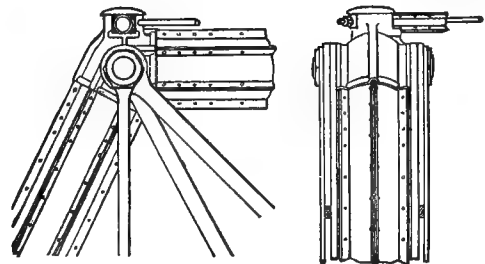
Connections, Phoenix Bridge Co.: Top Chord and Batter-Post.
